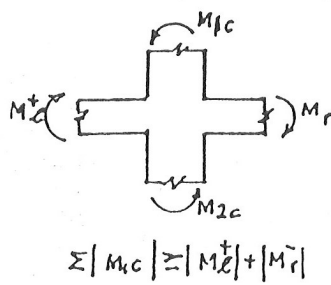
BEAM - COLUMN STRENGTH RATIO
